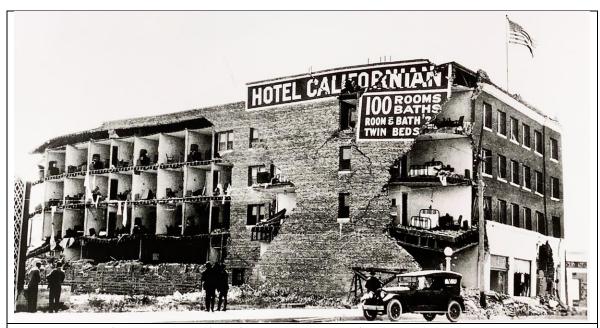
View of the west side of the four-story Hotel Californian. The walls collapsed outward and constructed with exterior walls of concrete encased structural steel columns and beams that surround brick panels (Sylvester and Mendes, 2011). Photo credit: Santa Barbara Historical Museum, Gledhill Library.
